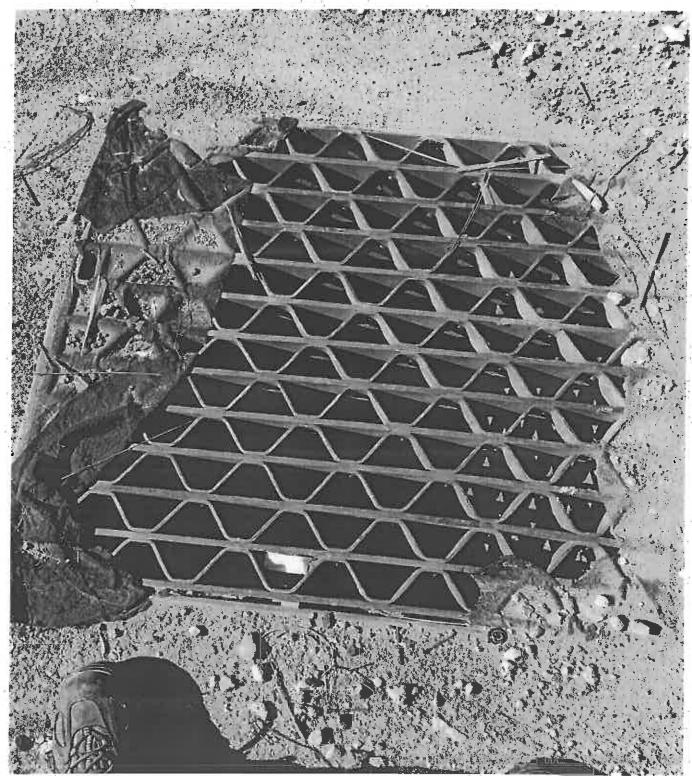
Exposed and unmaintained E and S (Atgrade inlet protection) North of the Site
